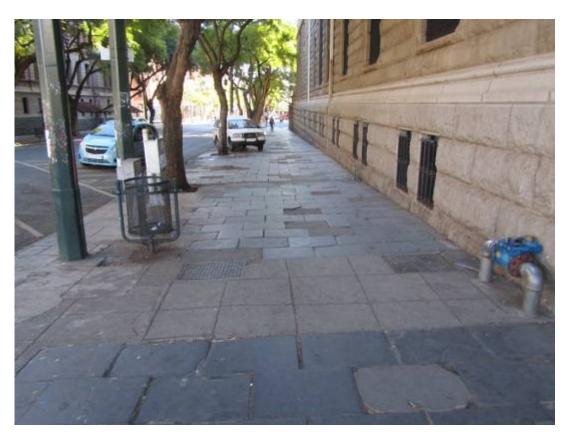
Historical slate paving adjacent to historical building. (P 946).
